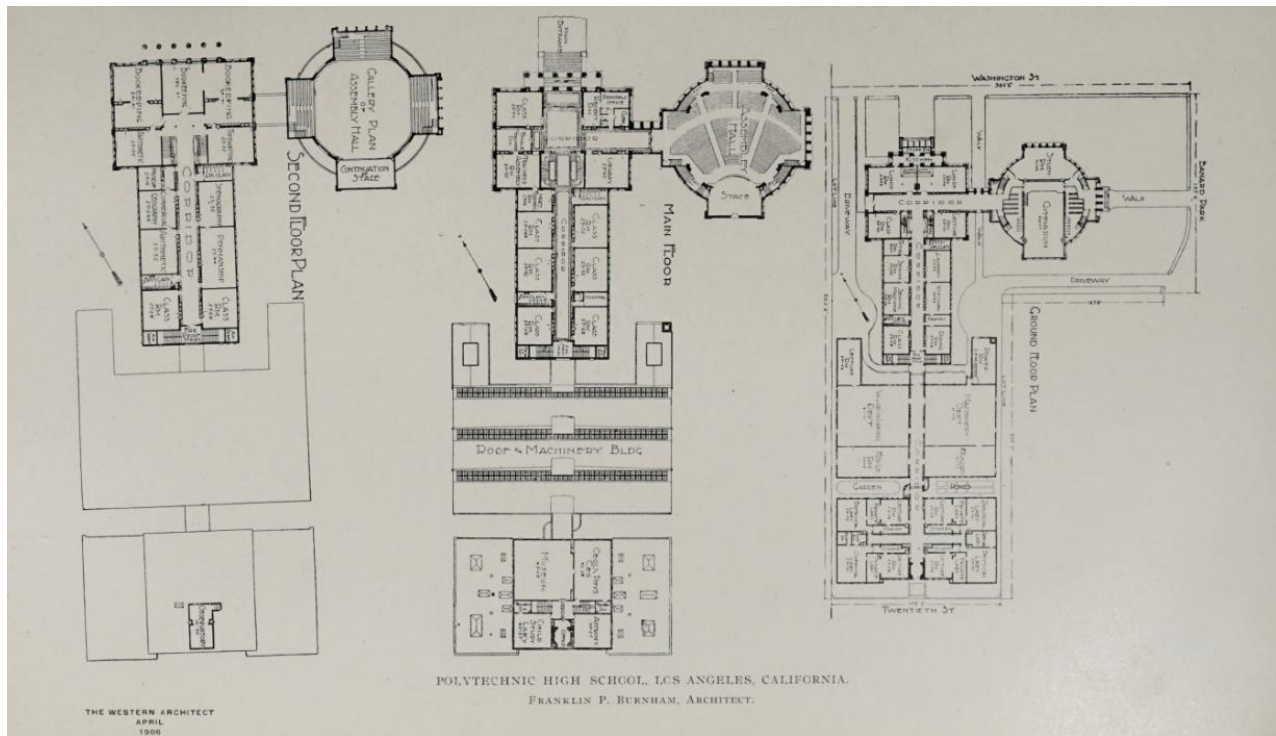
1906 architectural plan of Polytechnic High School by Franklin Burnham (Western Architect 1906)
